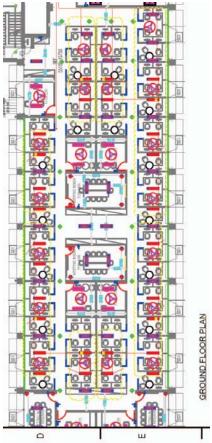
Mixed office plan showing internal lighting layout of west wing B1 on ground floor.
